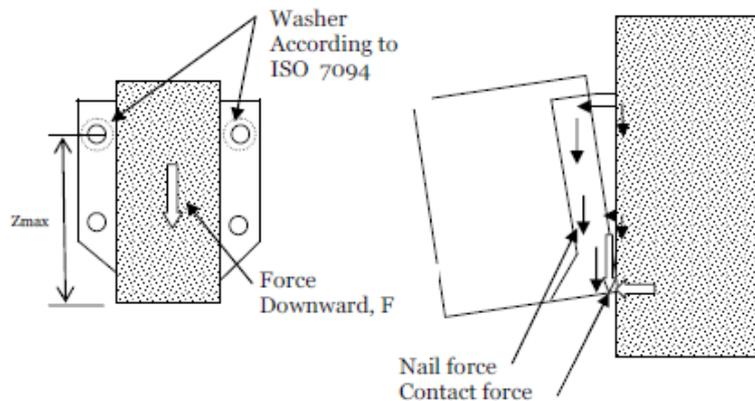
Left: Cross section in joist. Right: The joist will deflect and rotate, at the bottom a contact force will occur at the bottom plate, and the withdrawal forces in the bolts in the wall will vary linearly as assumed for nailed connections in the header.
